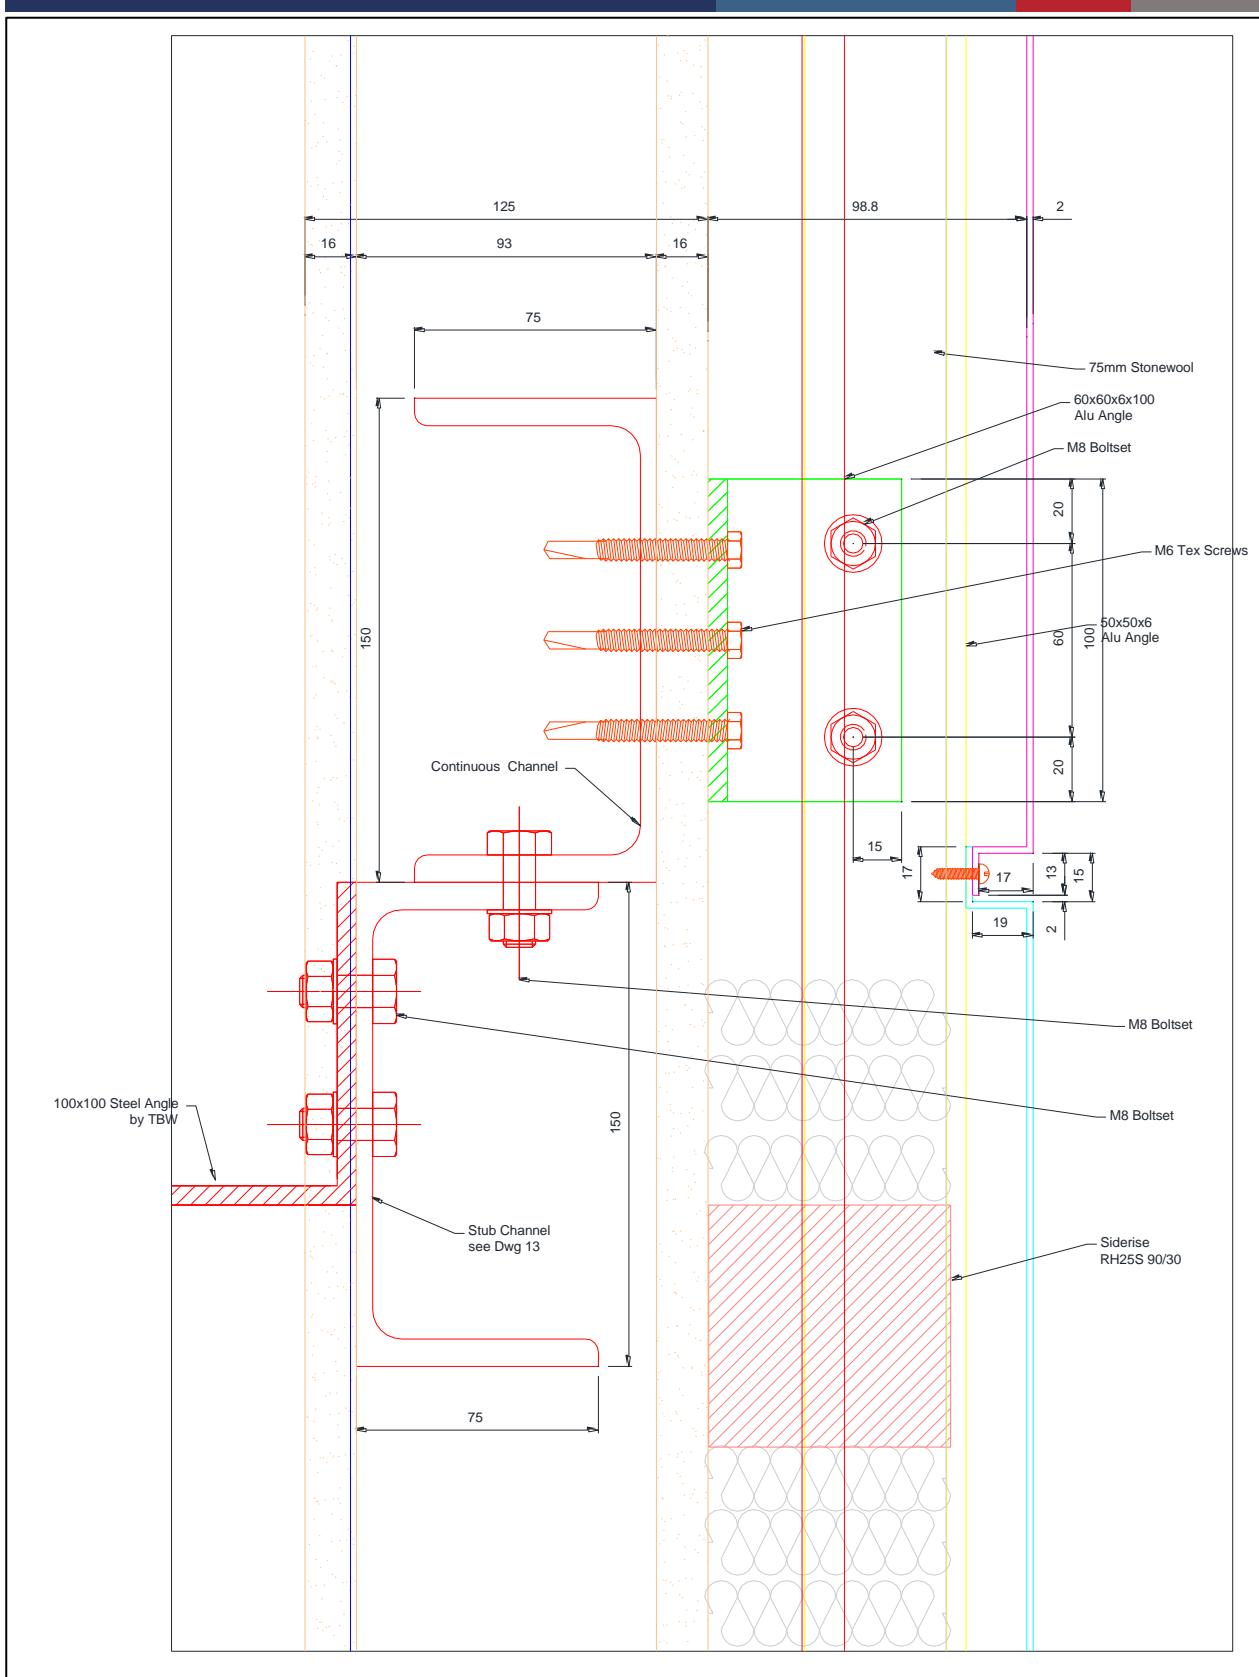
Detail D01 (Top edge of the wall) of the specimen.
